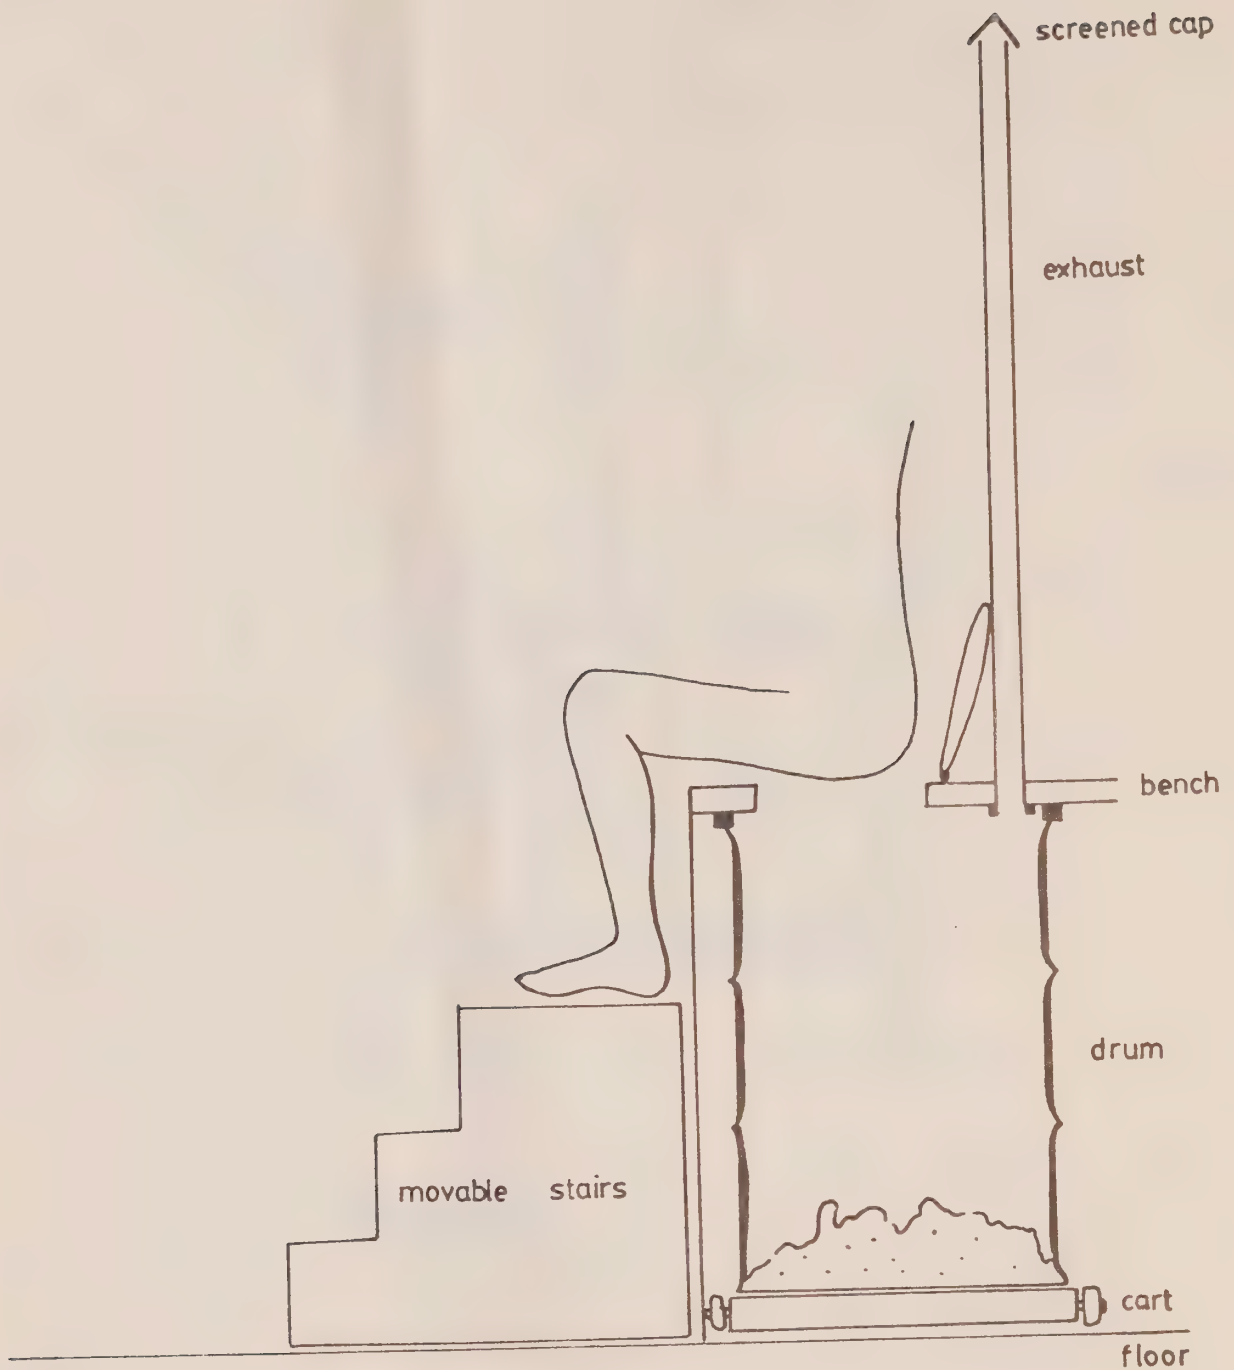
Side elevation of drum privy placed at normal floor level in the toilet room. Movable wooden stairs can be moved to achieve access to the compartment containing the drum. Drum rolls out easily on wooden or steel wheeled cart.
